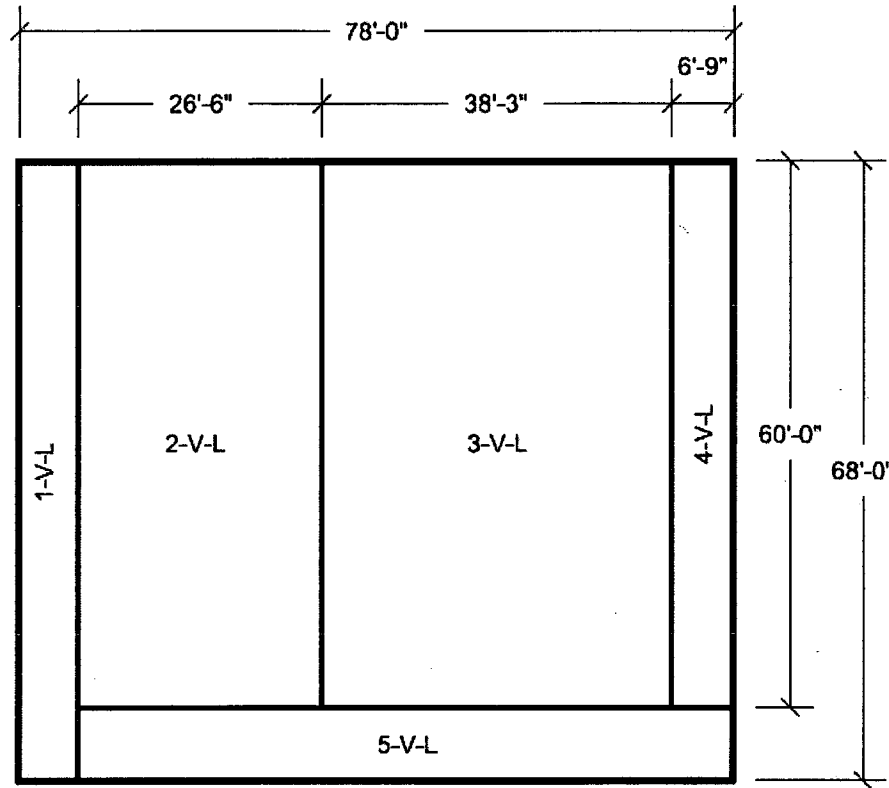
H.6-54 Pumphouse Pump House North Wall Looking South
